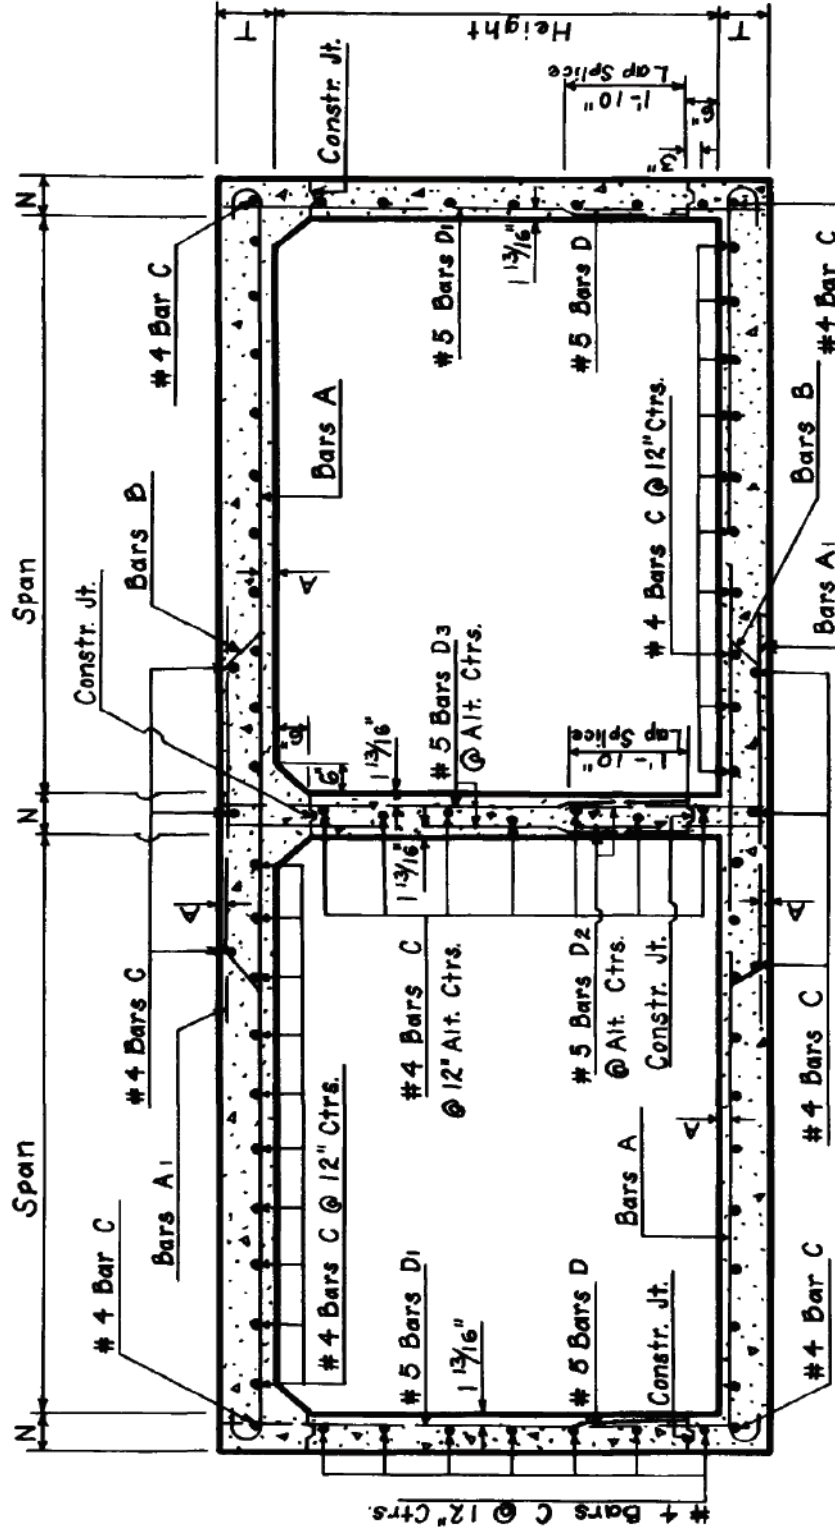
Typical La DOTD Double Barrel Cast-in-Place Box Culvert Cross Section (La
